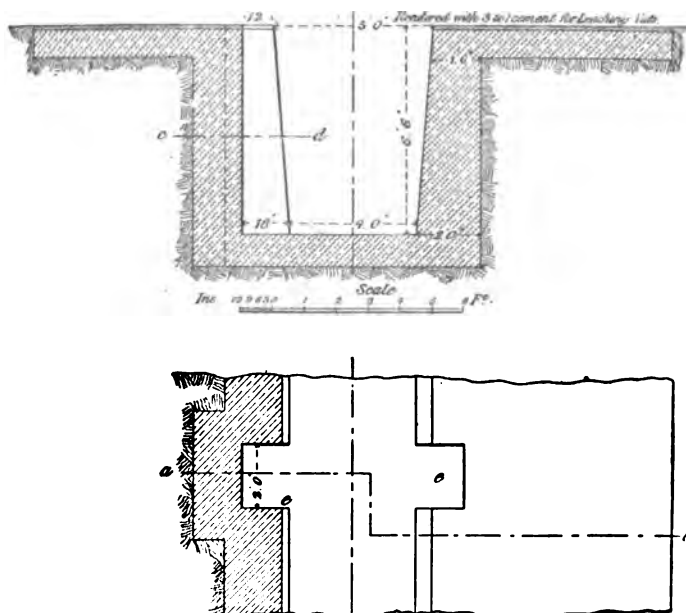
Masonry-lined Tunnel ; Section on *ab* and *cd* and Half Plan.
